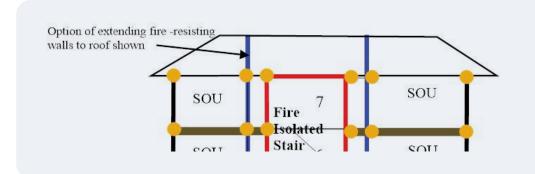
Design option to extend fire walls to roof level in lieu of using large cavity barriers within a fire-protected timber roof system.
